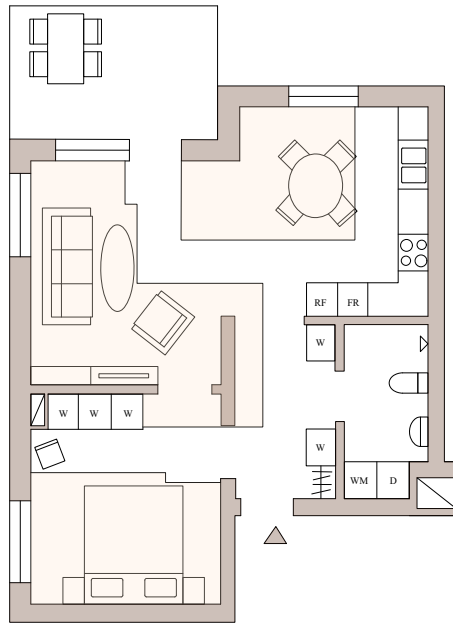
Furnishable zones in floor plan. Redrawn from MAB [55]
